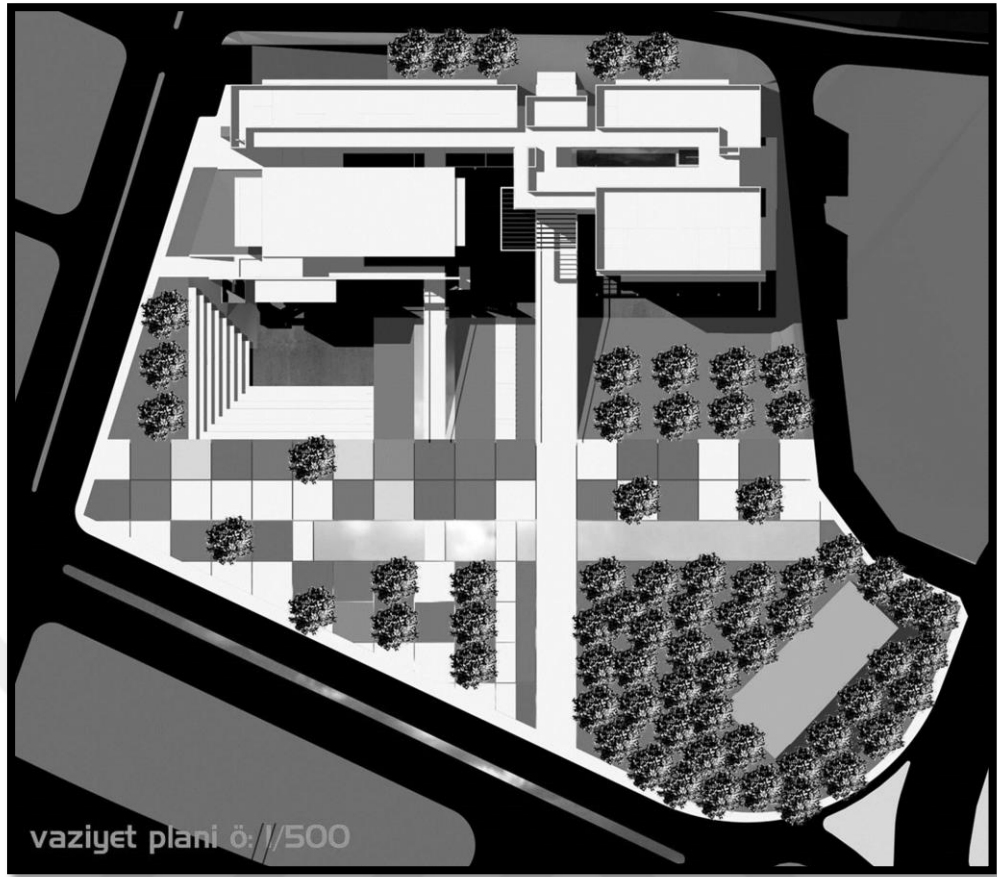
Pendik Municipality Service Building Competition, First Prize, Site plan (Anonymous, 2006)
